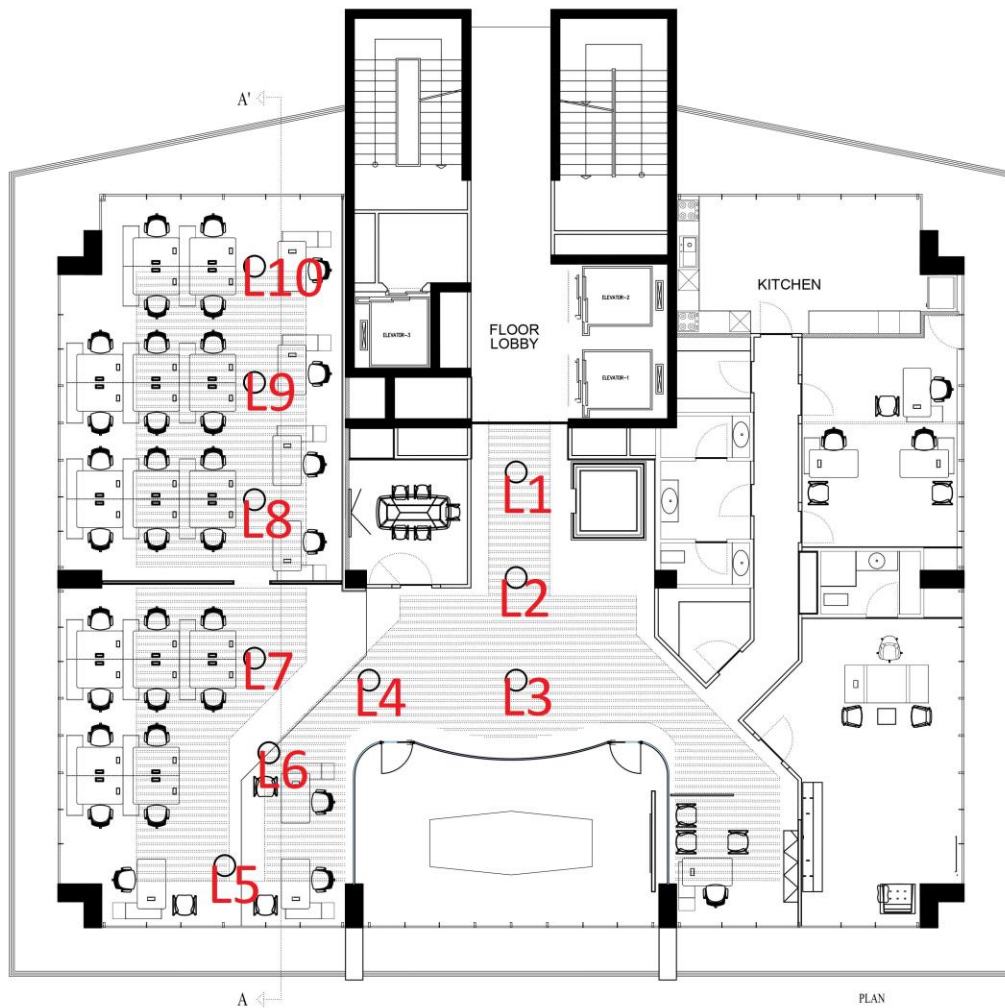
Floor plan of the Demay Architects' Office and 10 Locations are displayed with red signs on the plan (not to scale)
